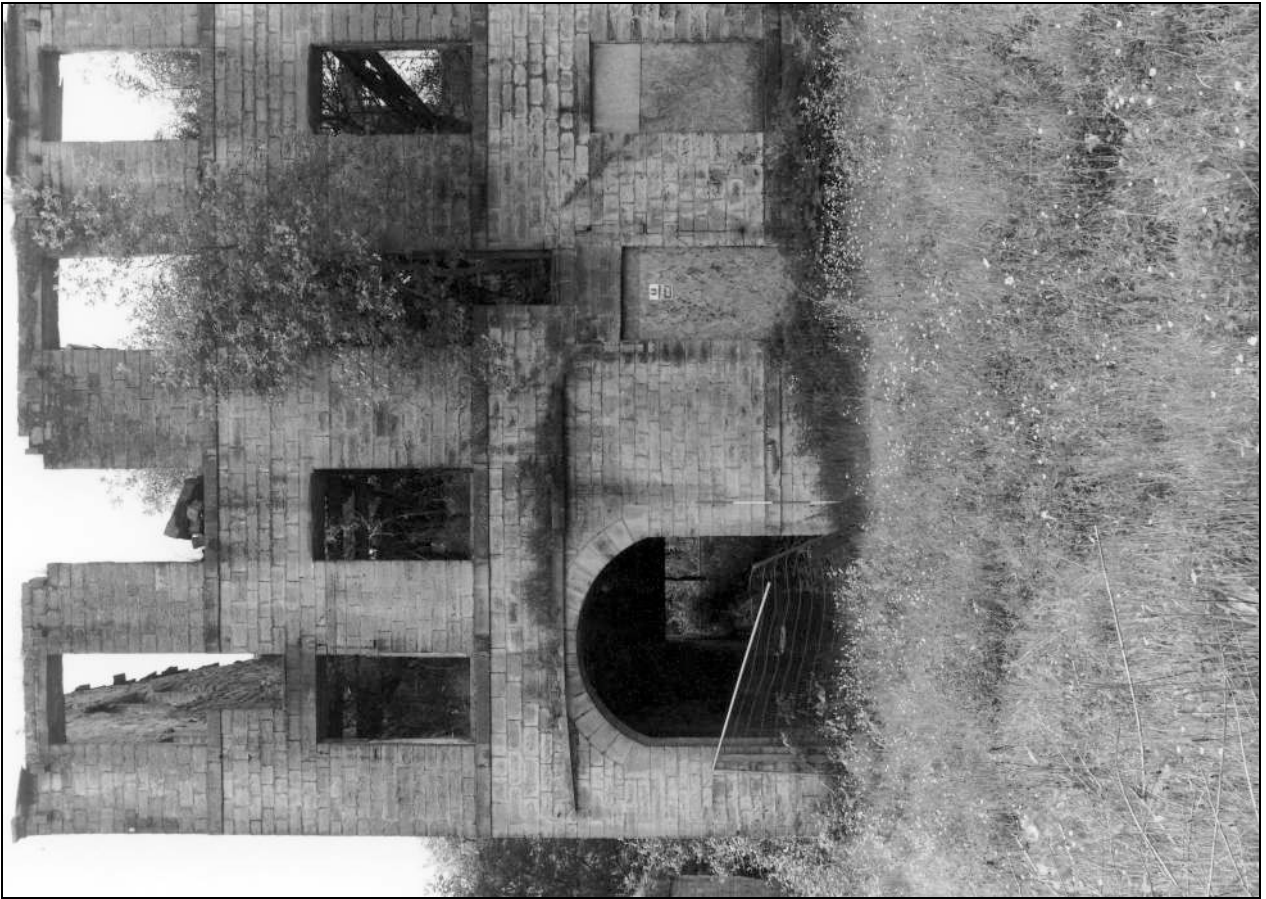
Spinning mill: east end of north elevation, with arch to horizontal engine room (film 1, frame 3)
